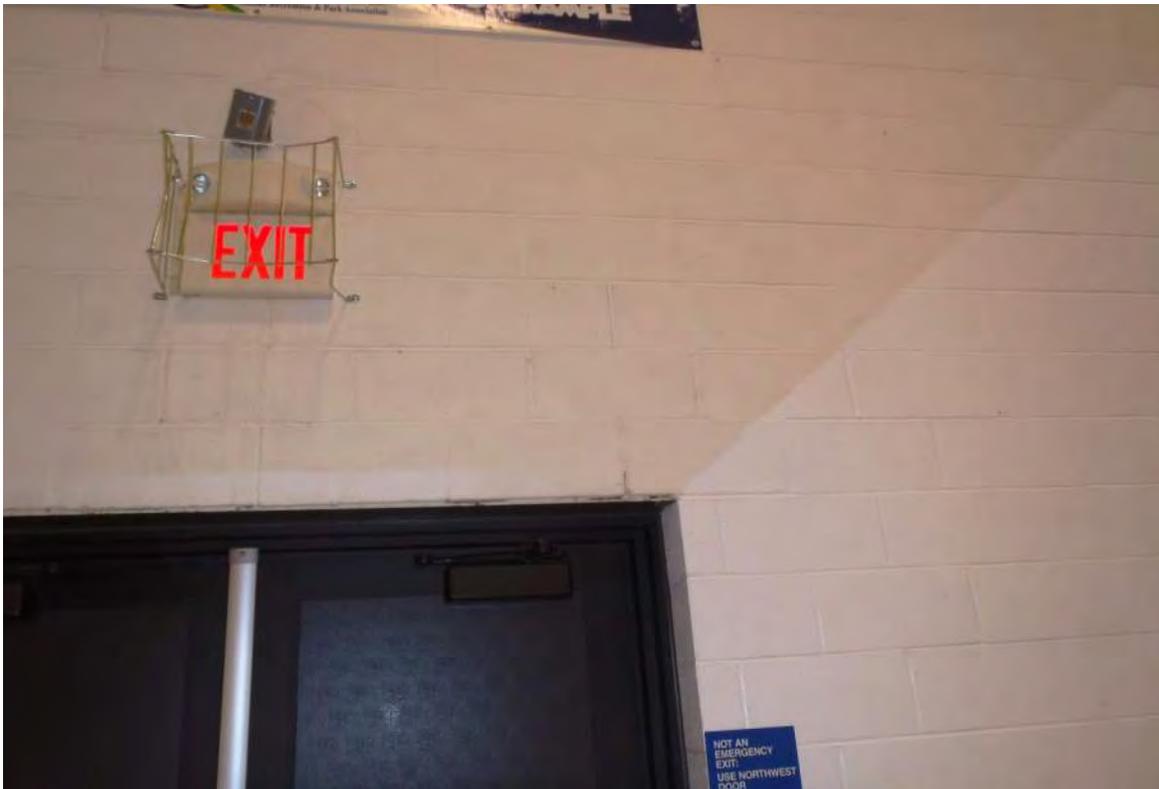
A - Masonry Cracking at Interior Gymnasium Wall
